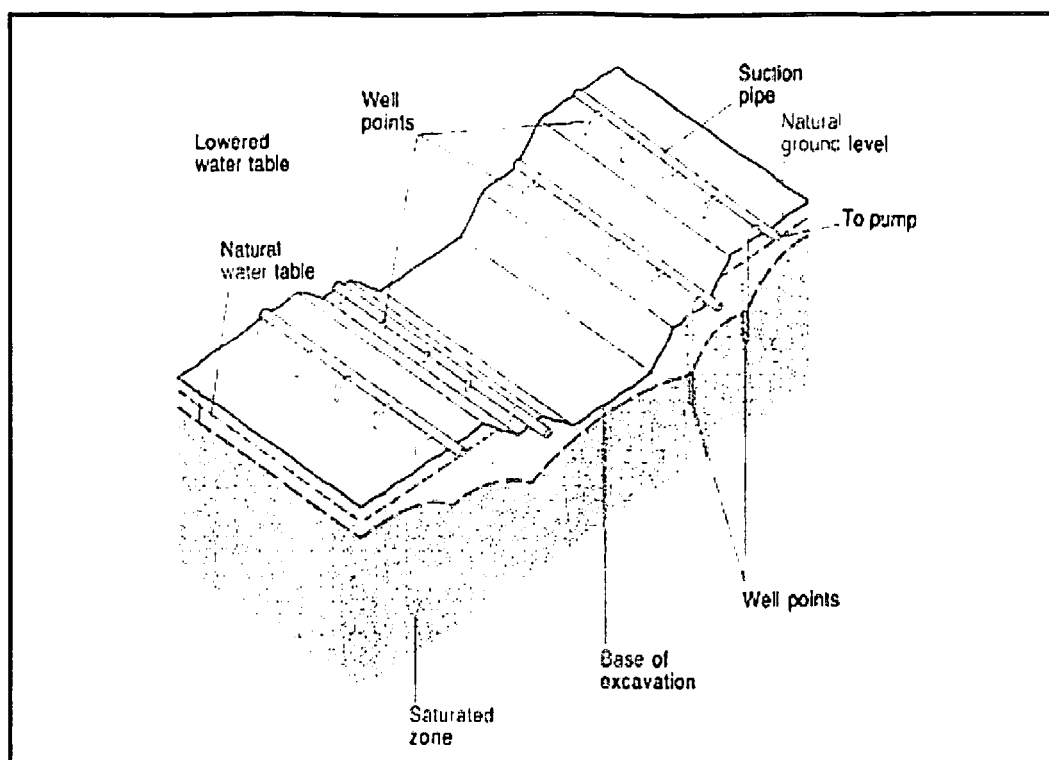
Site dewatering, using a two-stage dewatering system with wells to lower the water table beneath the excavation (Michael Price, 1996).
